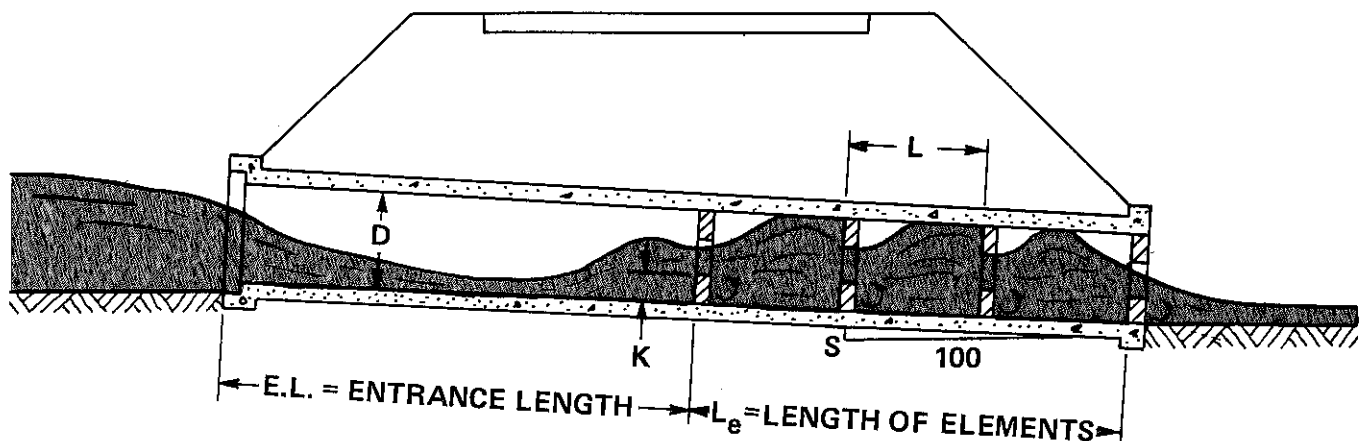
TUMBLING FLOW IN PIPE CULVERT.
